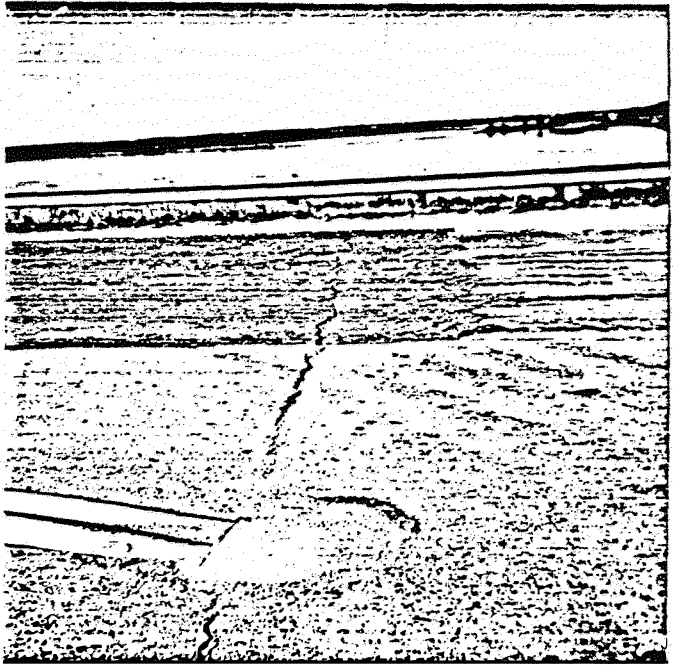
Crack on the pavement above the abutment and bridge approach on another bridge.
